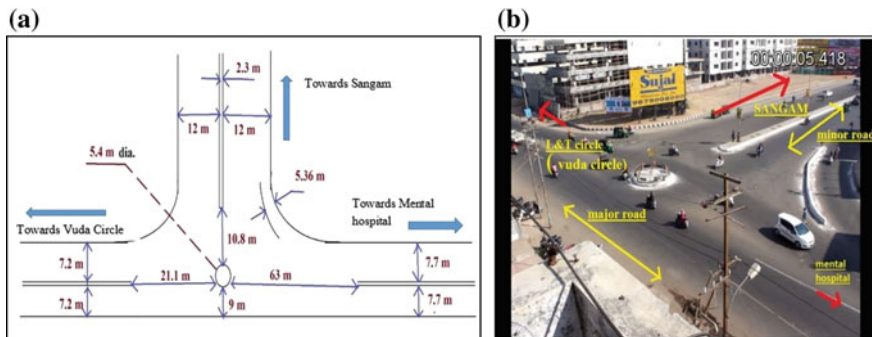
a Geometric dimension of intersection b camera view of intersection
